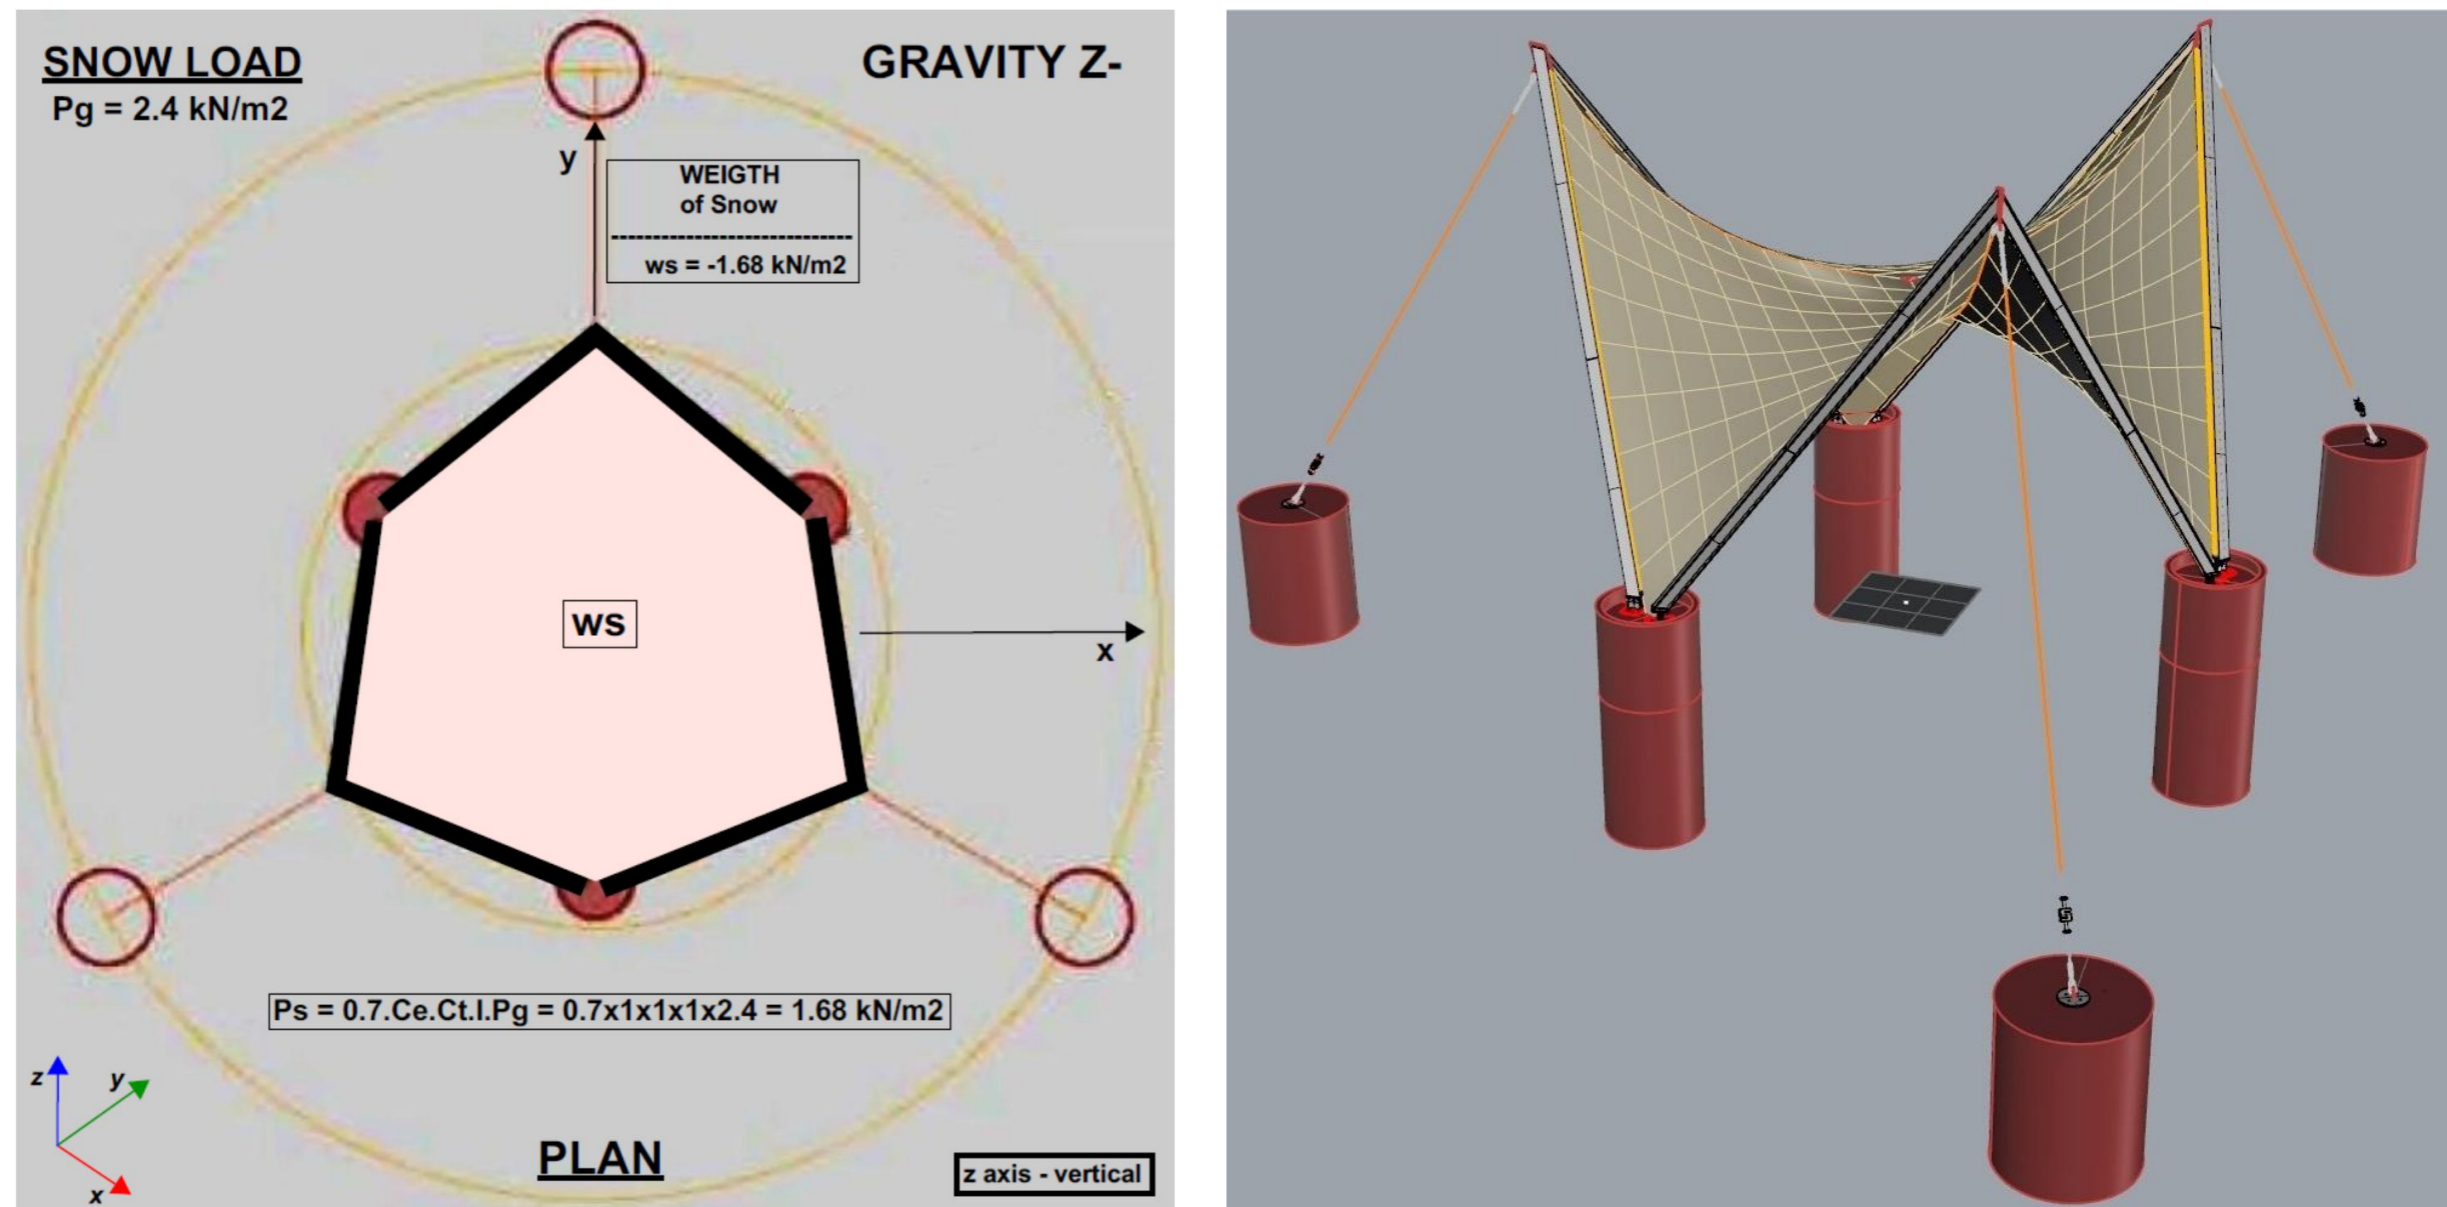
Step 5 – 3D Prototype structure with Snow Load condition and Isometric View of the 3D model.
